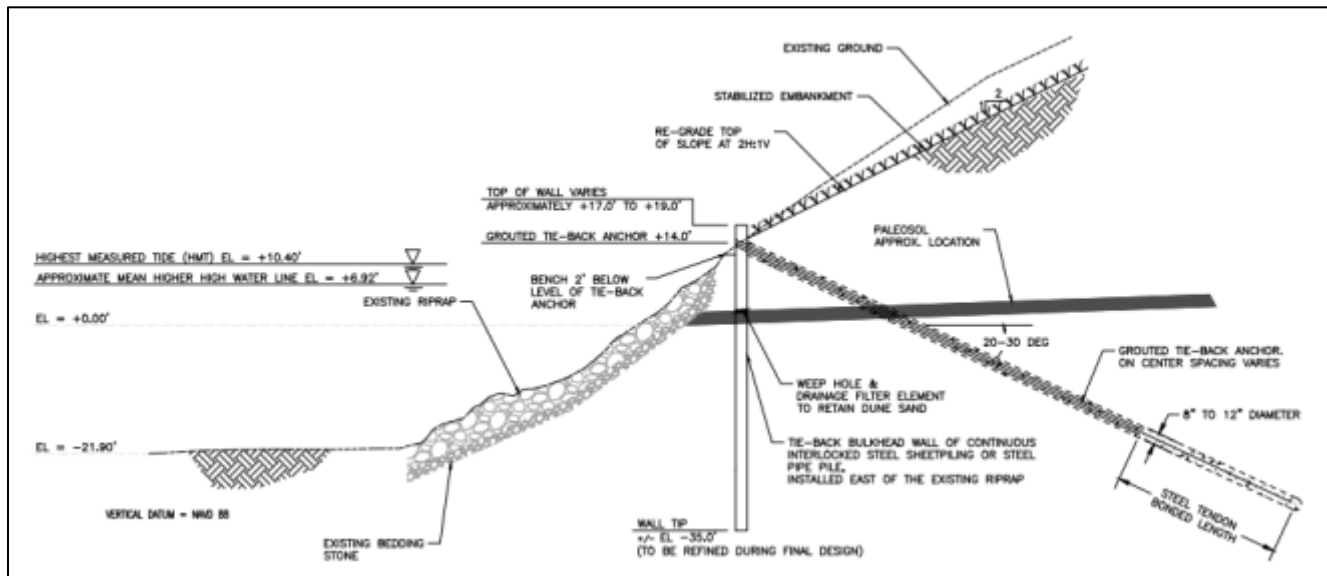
Preliminary design of a typical section for the tubular steel interlocking pile wall
